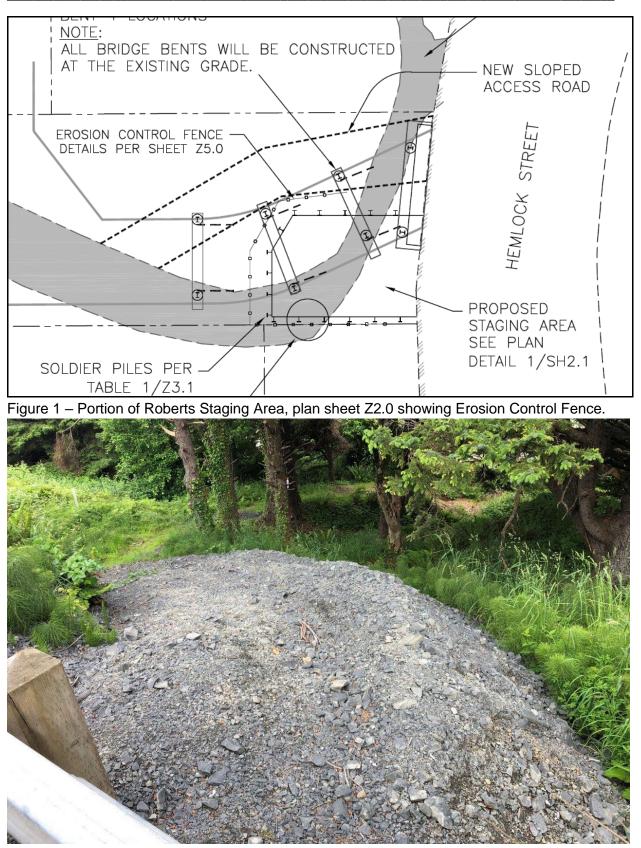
Photo of well-graded aggregate temporary access ramp in place, provided by PLI. 10655 S.W. Park Street • Tigard, Oregon 97223 • Phone 360-903-4861• Email warrenkrager@gmail.com
